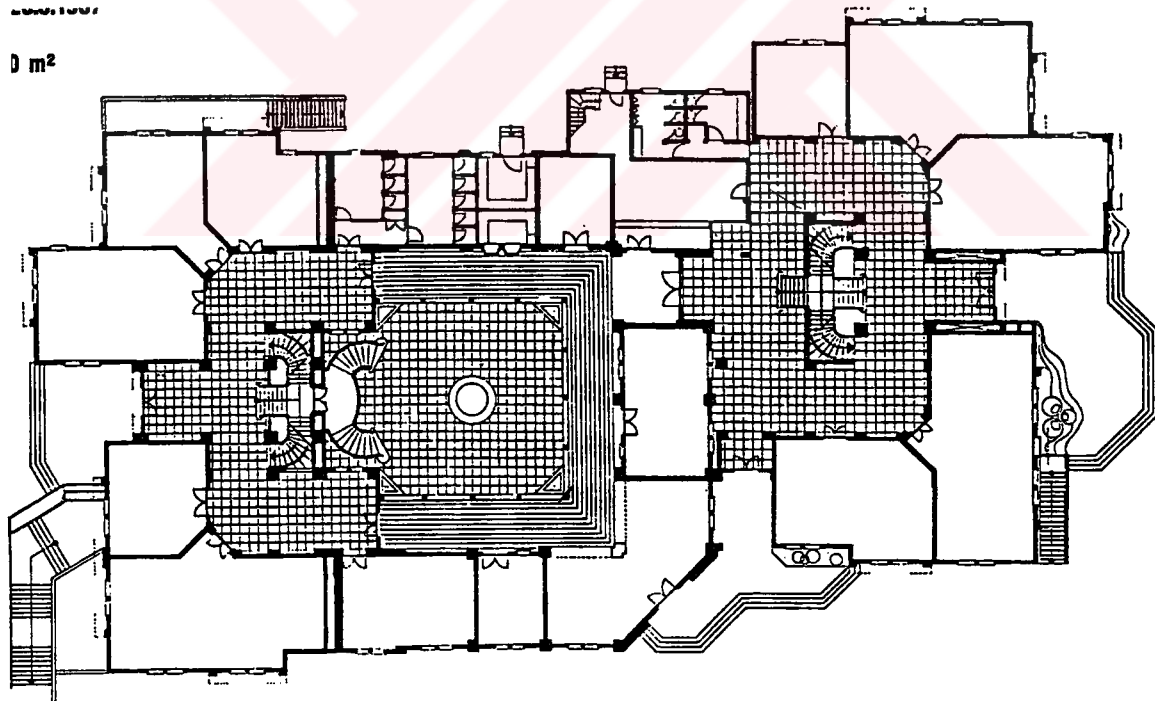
The Avanos Bazaar 54 Carpet Shop, Ground Floor Plan
